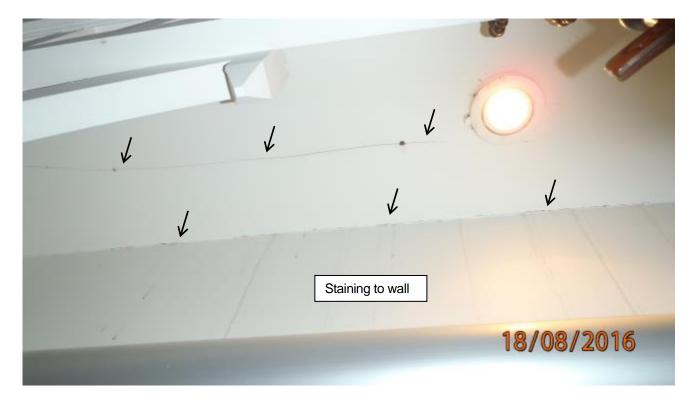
shows cracking to the wall / cornice junction outside the Laundry.
